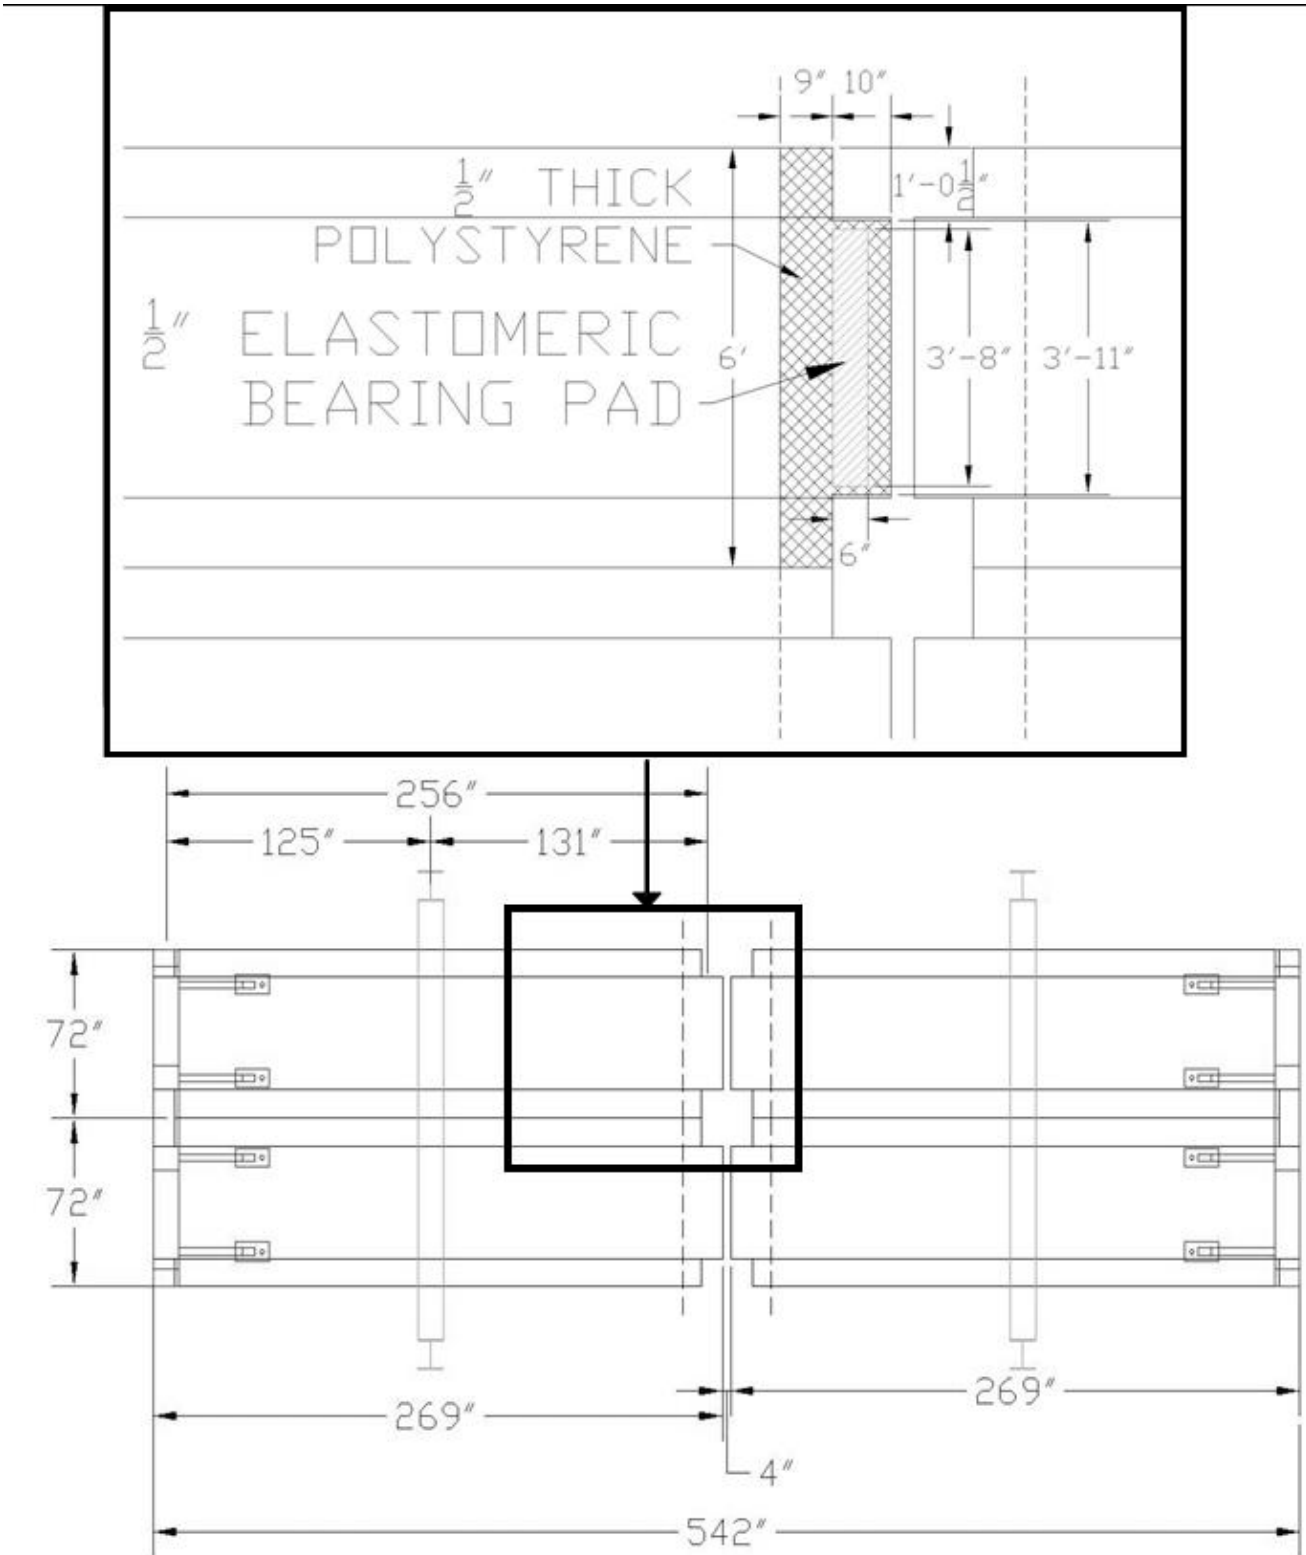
Plan layout of laboratory bridge specimen with enlargement of precast support at pier
